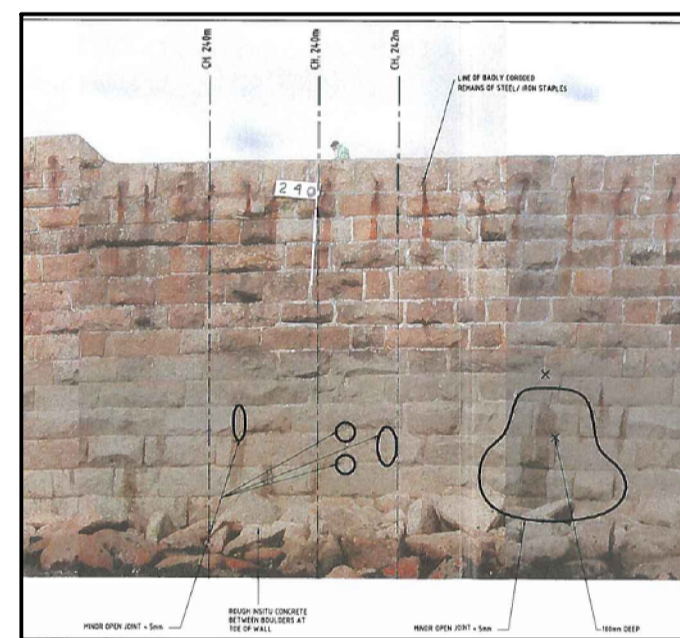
Eastern Section of the Lighthouse Pier (Southern Face)
